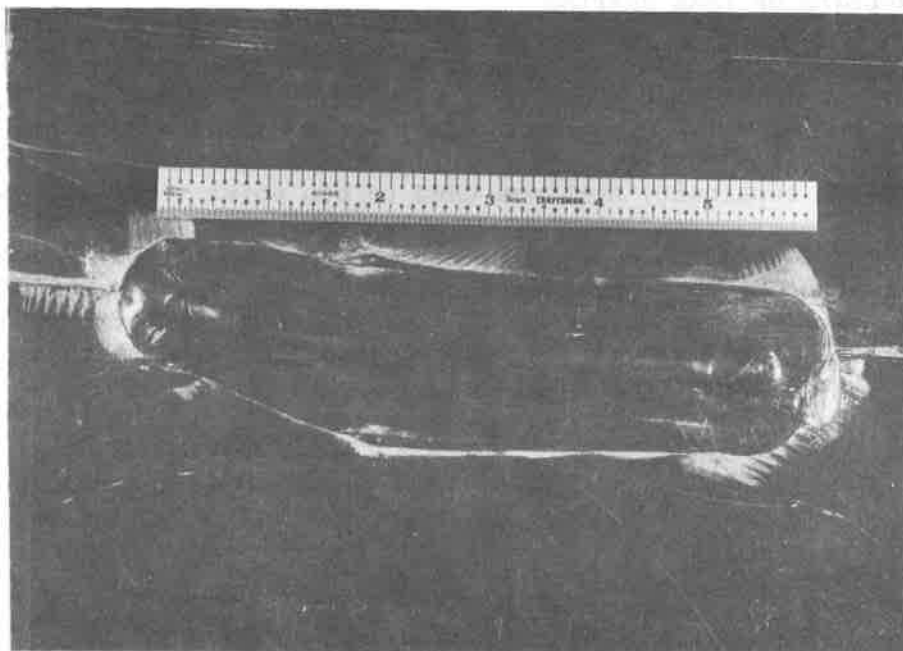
TOP VIEW OF EXTRUSION FILLET WELD ON 60 MIL HDPE LINER
